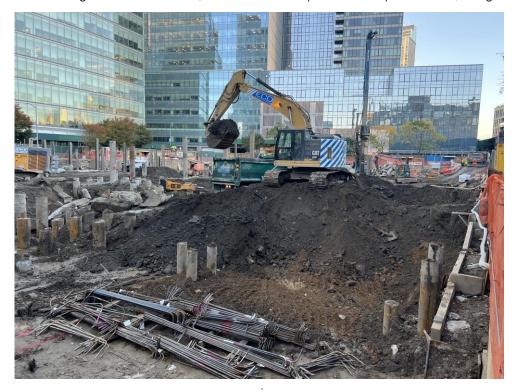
ECD loading non-hazardous soil/fill from the stockpile into a disposal truck (facing south).
